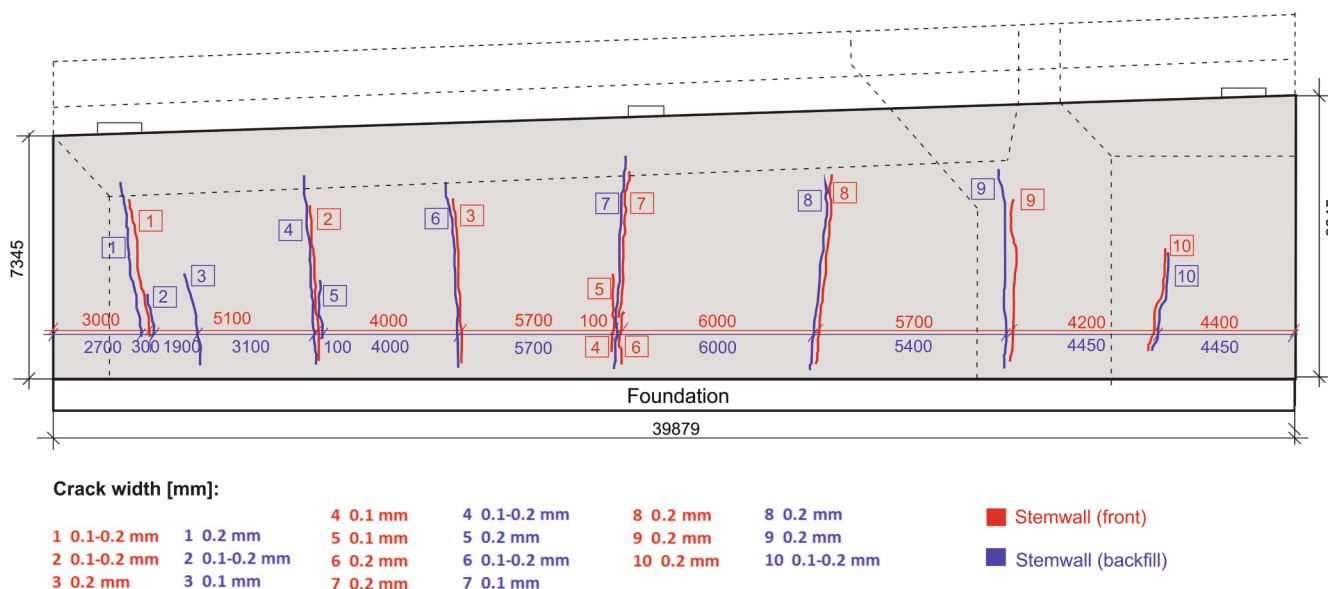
The thermal cracks observed in early ages of concrete in a bridge abutment wall.
